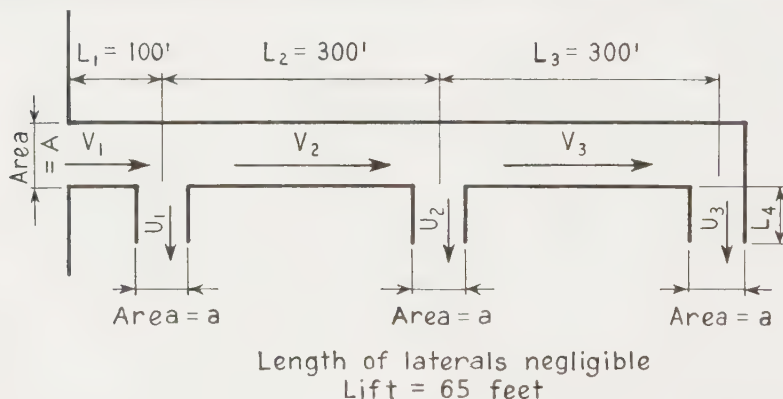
Elementary filling system. Longitudinal conduit with short laterals.
